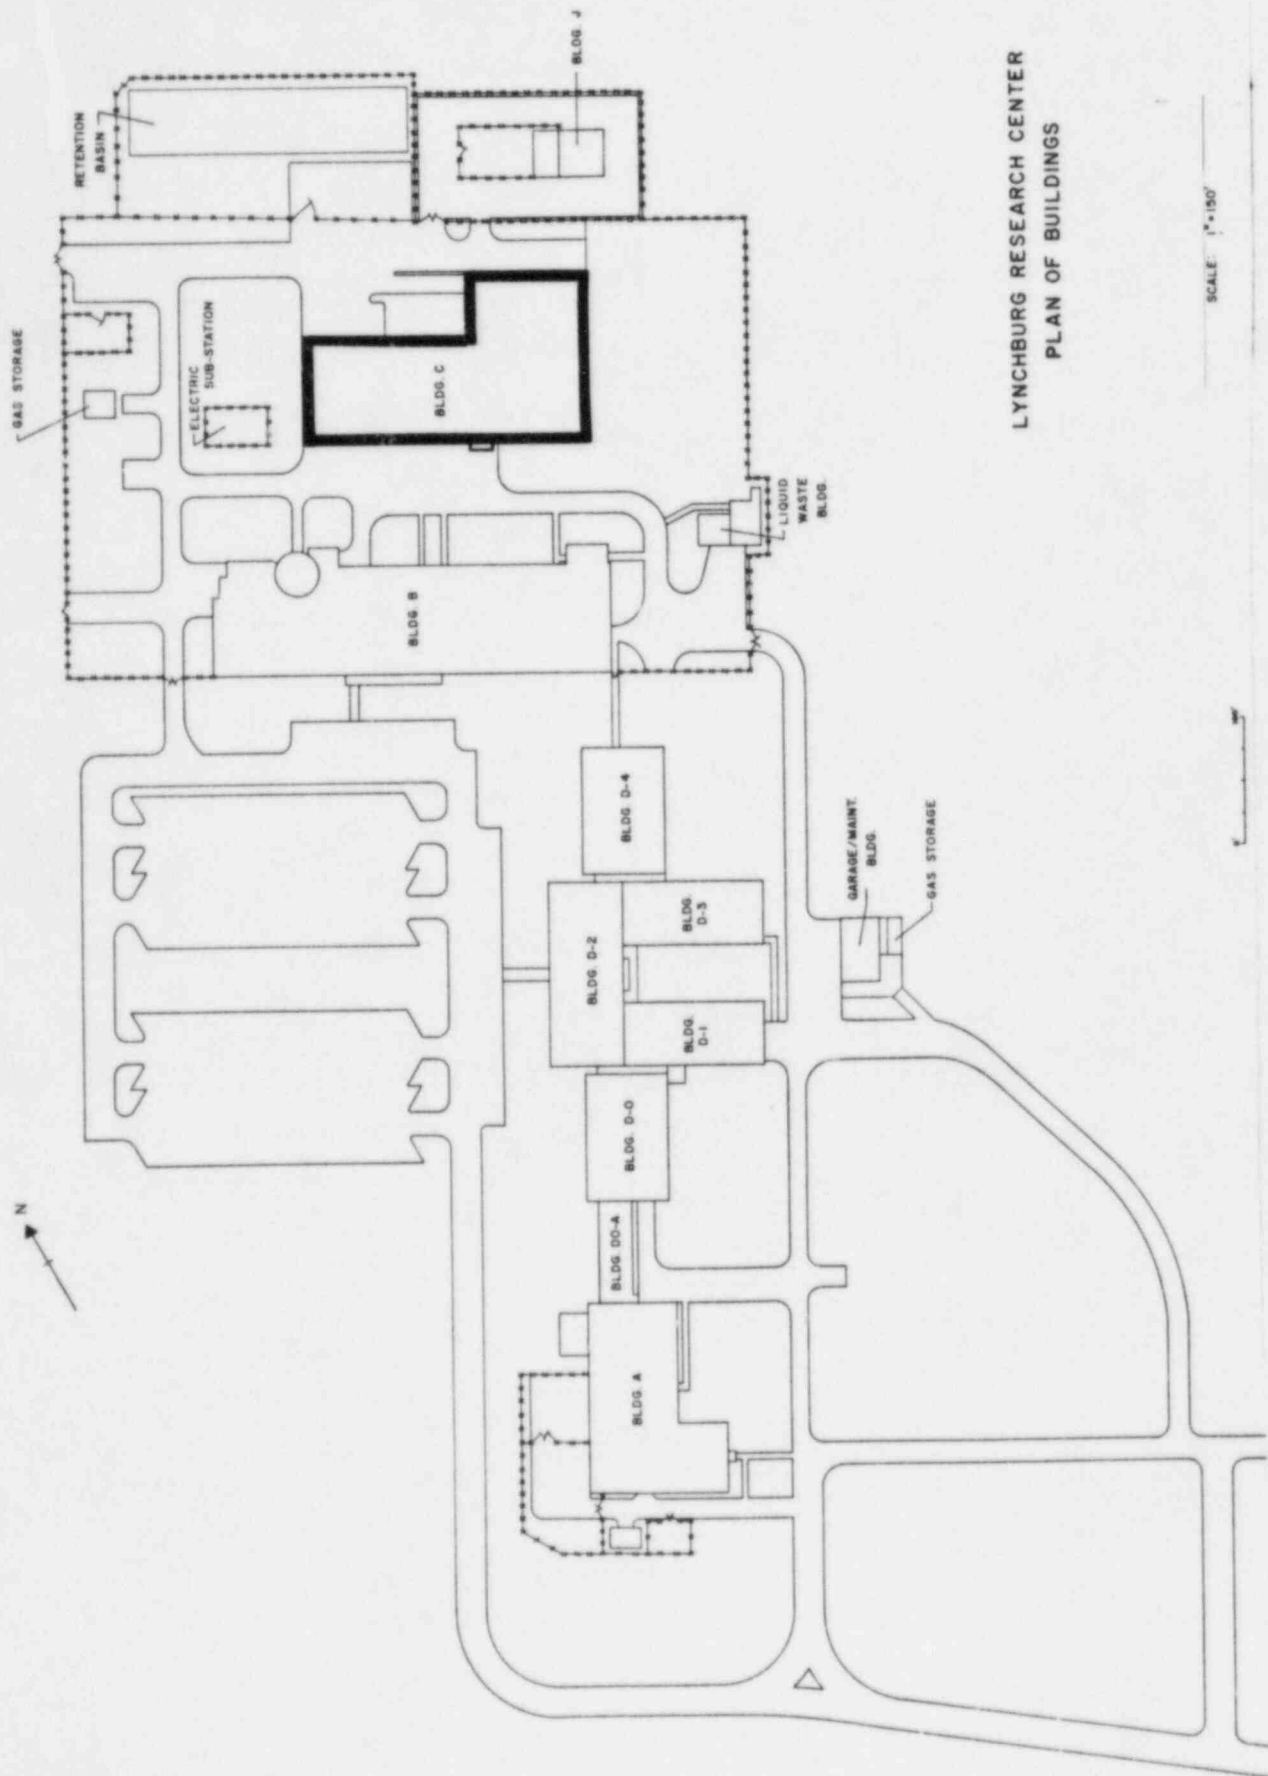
LYNCHBURG RESEARCH CENTER PLAN OF BUILDINGS
